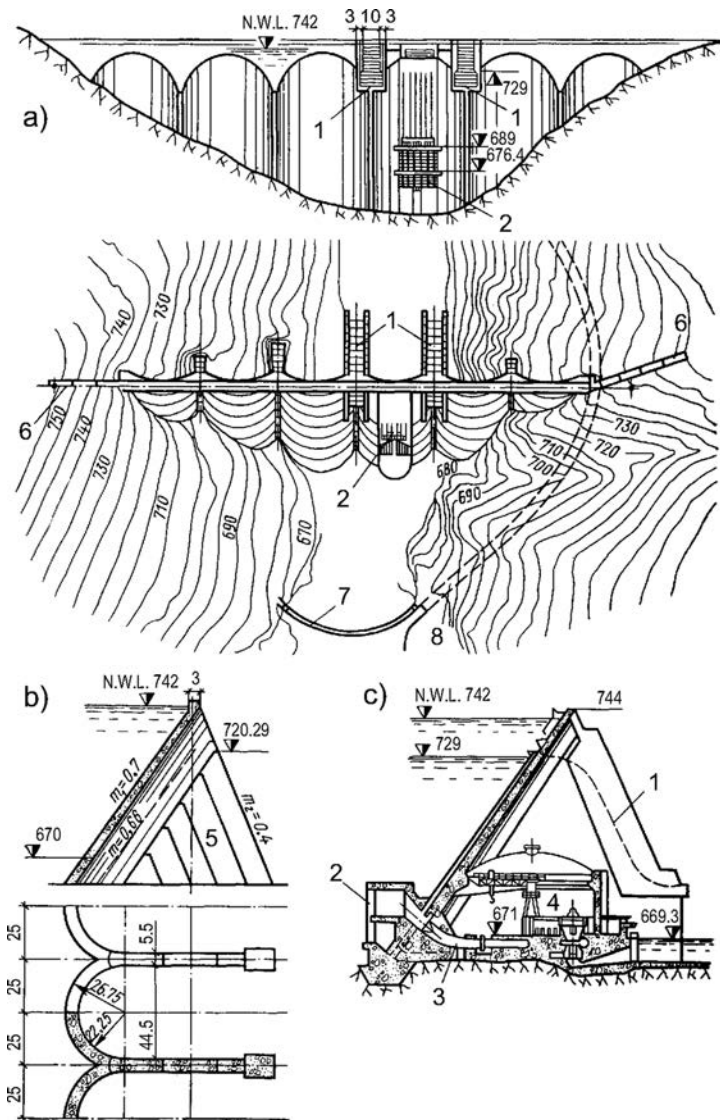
Grandval Dam (France). (a) Layout and view of the upstream face; (b) cross-section and layout of the dam; (c) section through the span with hydroelectric power station. (1) Spillway in the buttress; (2) trash rack; (3) penstock; (4) power house; (5) joints; (6) grout curtains in bank; (7) cofferdam; (8) diversion tunnel.
